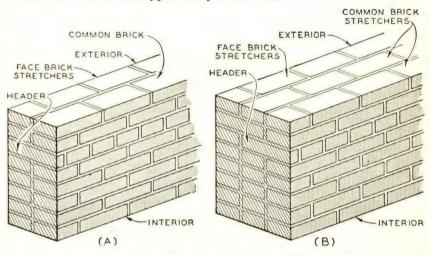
Eight- and Twelve-Inch Brick Walls in Common Bond
